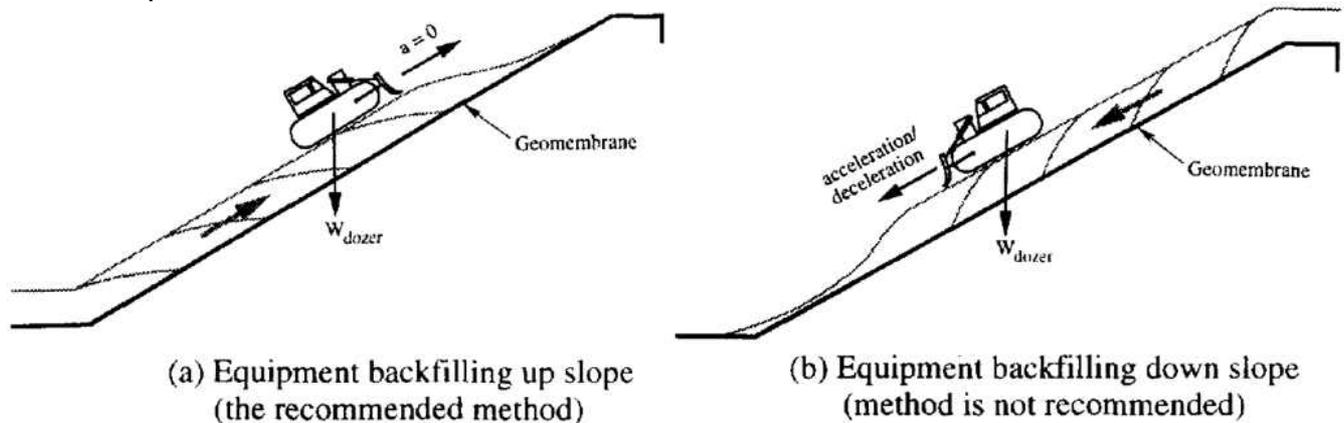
Construction equipment placing cover soil on slopes with geosynthetics (from Koerner and Soong, 1998).
